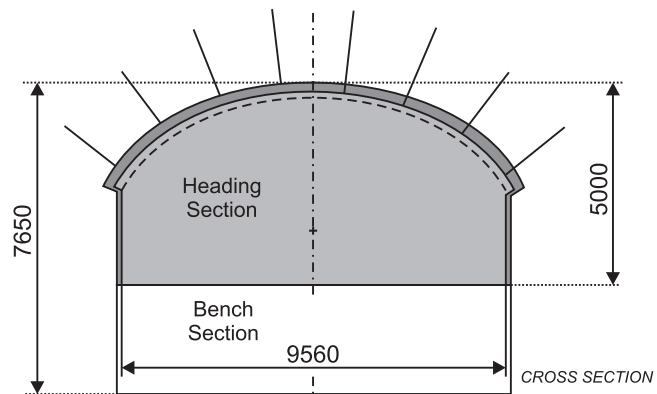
6. *Excavated tunnel profile in railway in Sydney, Australia.
